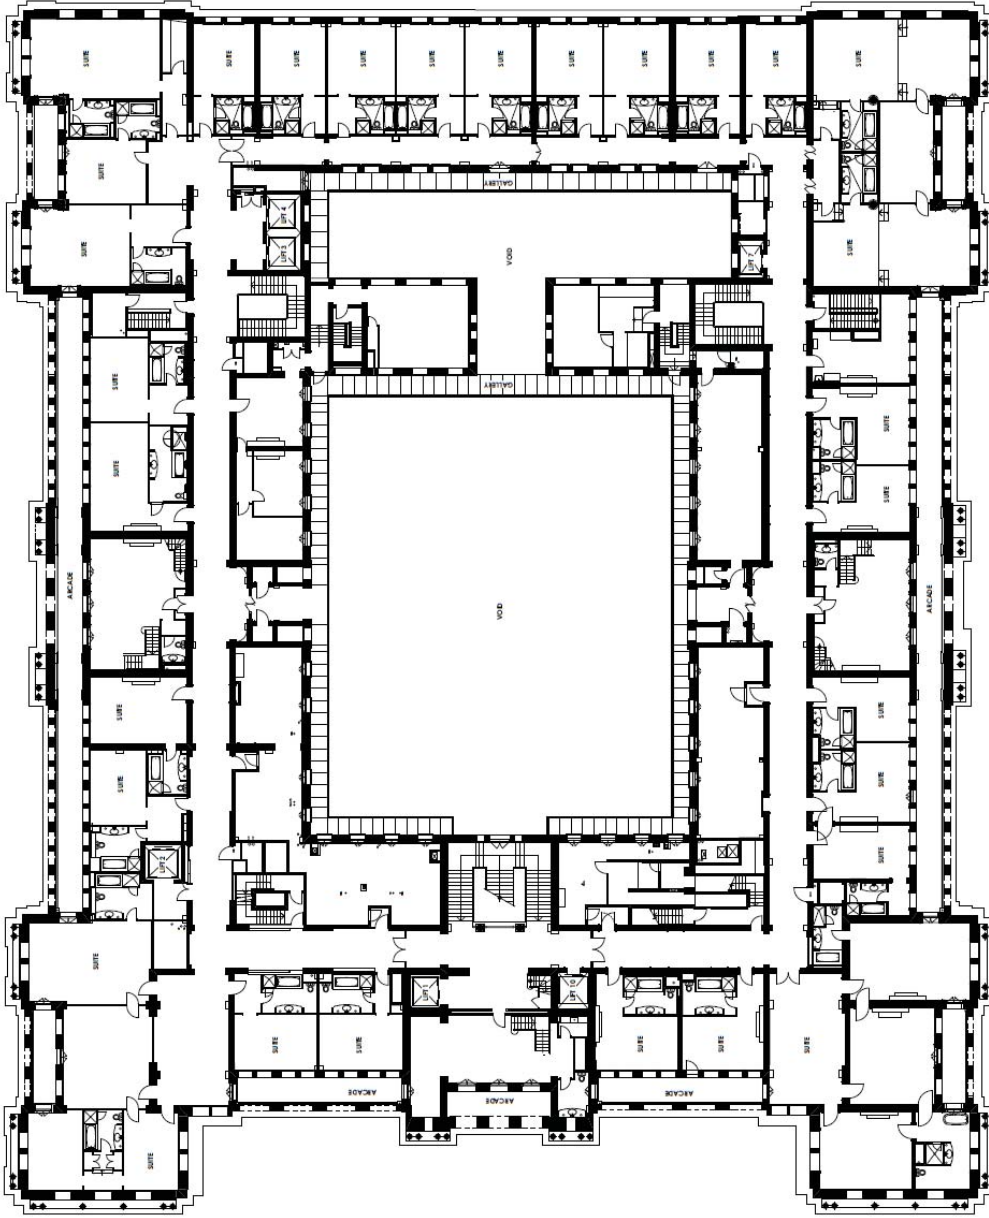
Floor Plan, Level 3 (ML Design 2016)
